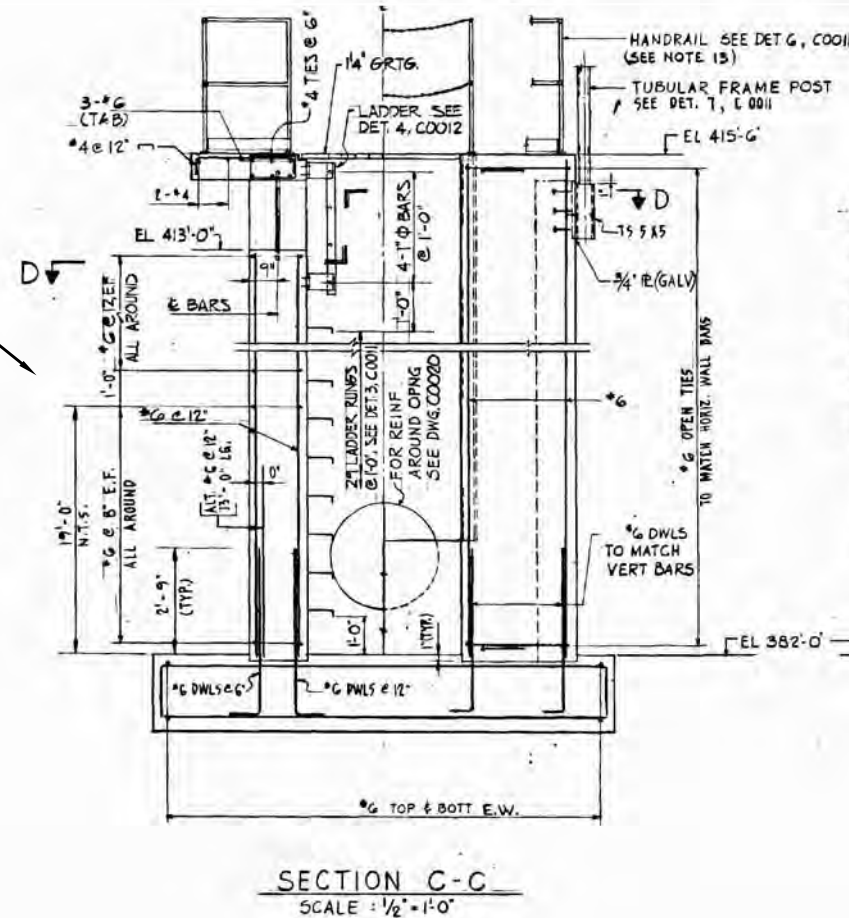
IMAGE REFERENCE: BIG RIVERS ELECTRIC CORPORATION COLEMAN POWER PLAN, DRAWDOWN STRUCTURE FOUNDATION PLAN AND SECTIONS, DRAWING C0010 BY BURNS AND ROE, INC., MAY 31, 1979
